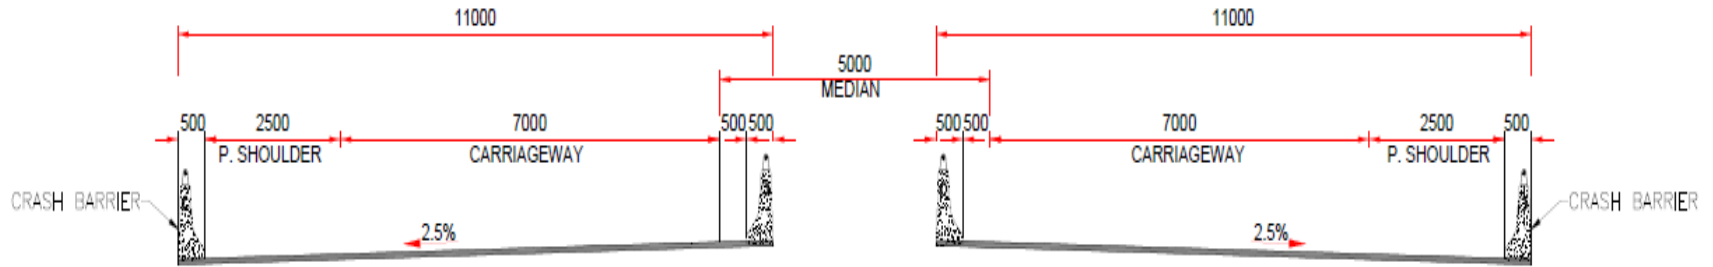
Proposed Madiwala Extension plan to decongest the traffic
